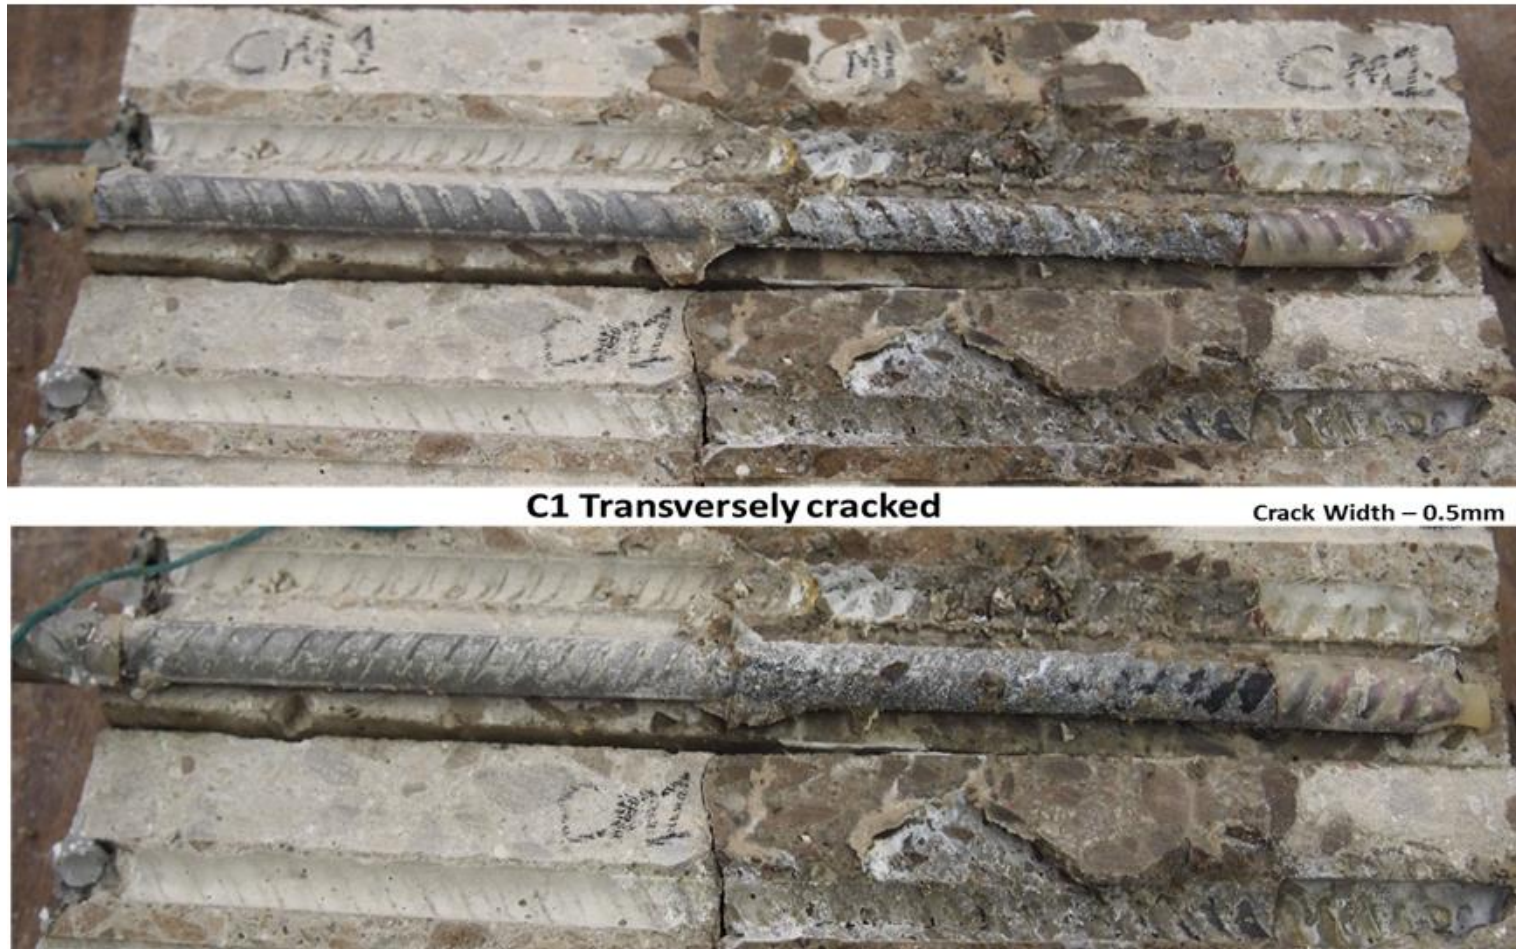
Concrete specimen of autopsied transversely cracked C1 specimen
